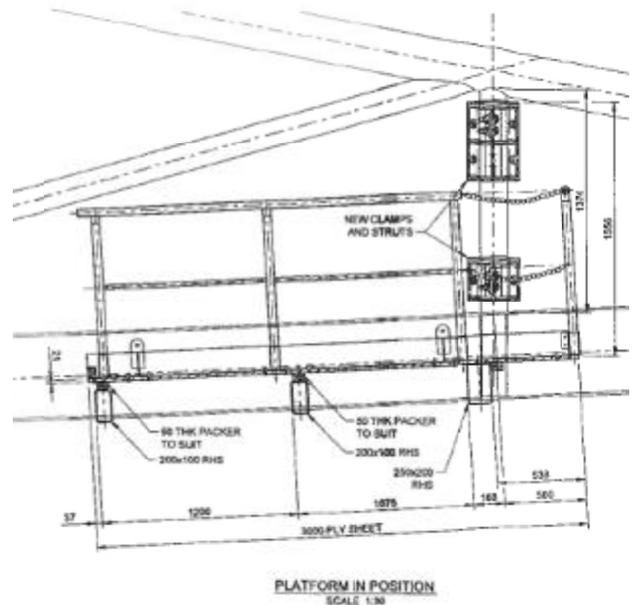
FEGL Shop Drawing of Craned Access Platforms
